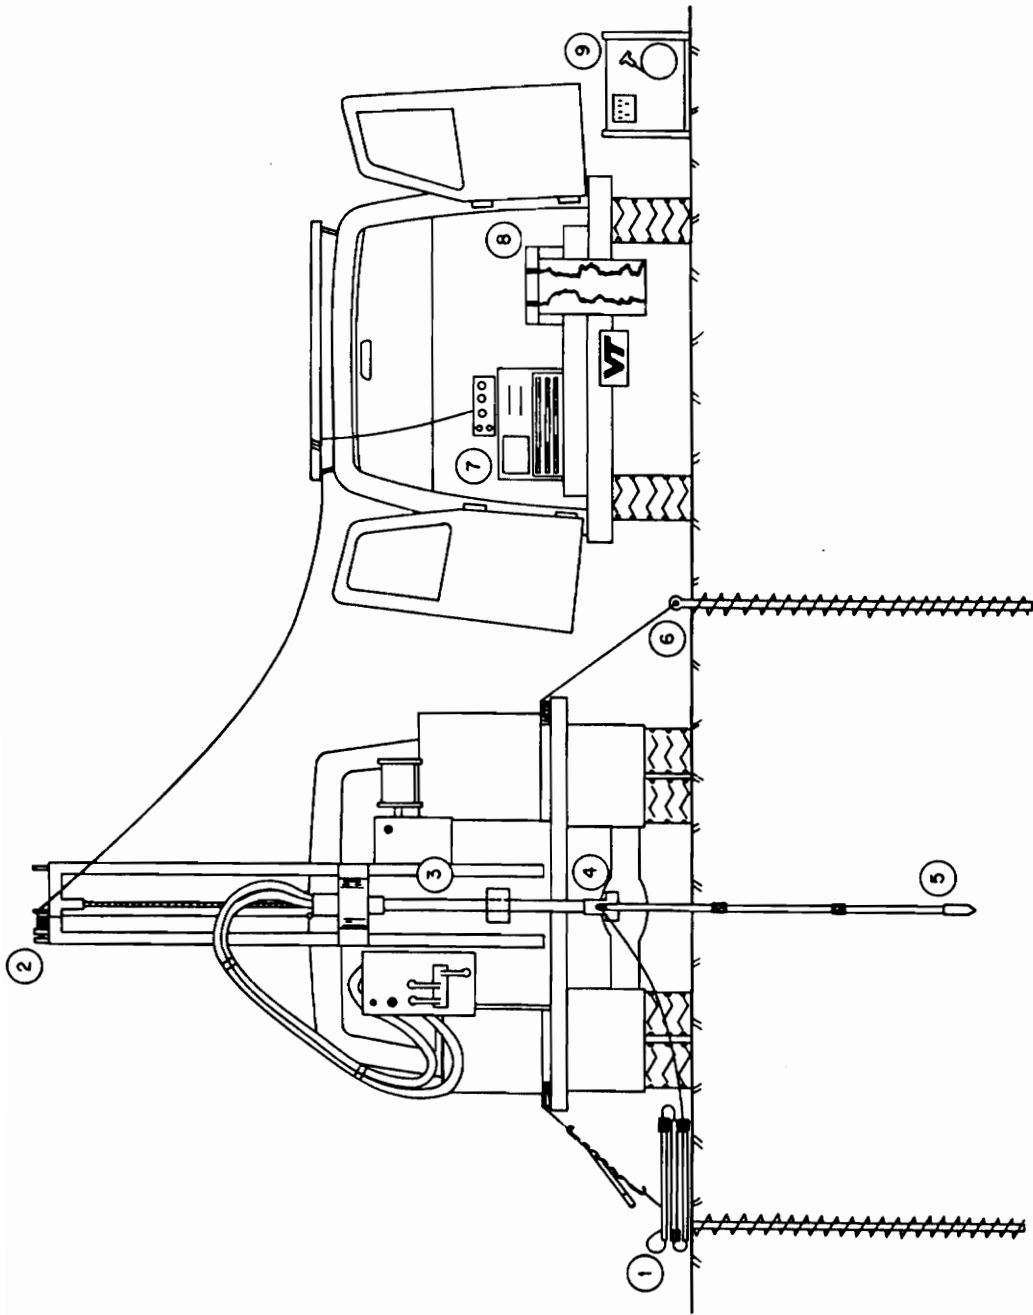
EQUIPMENT LAYOUT FOR THE CONE PENETRATION SYSTEM
